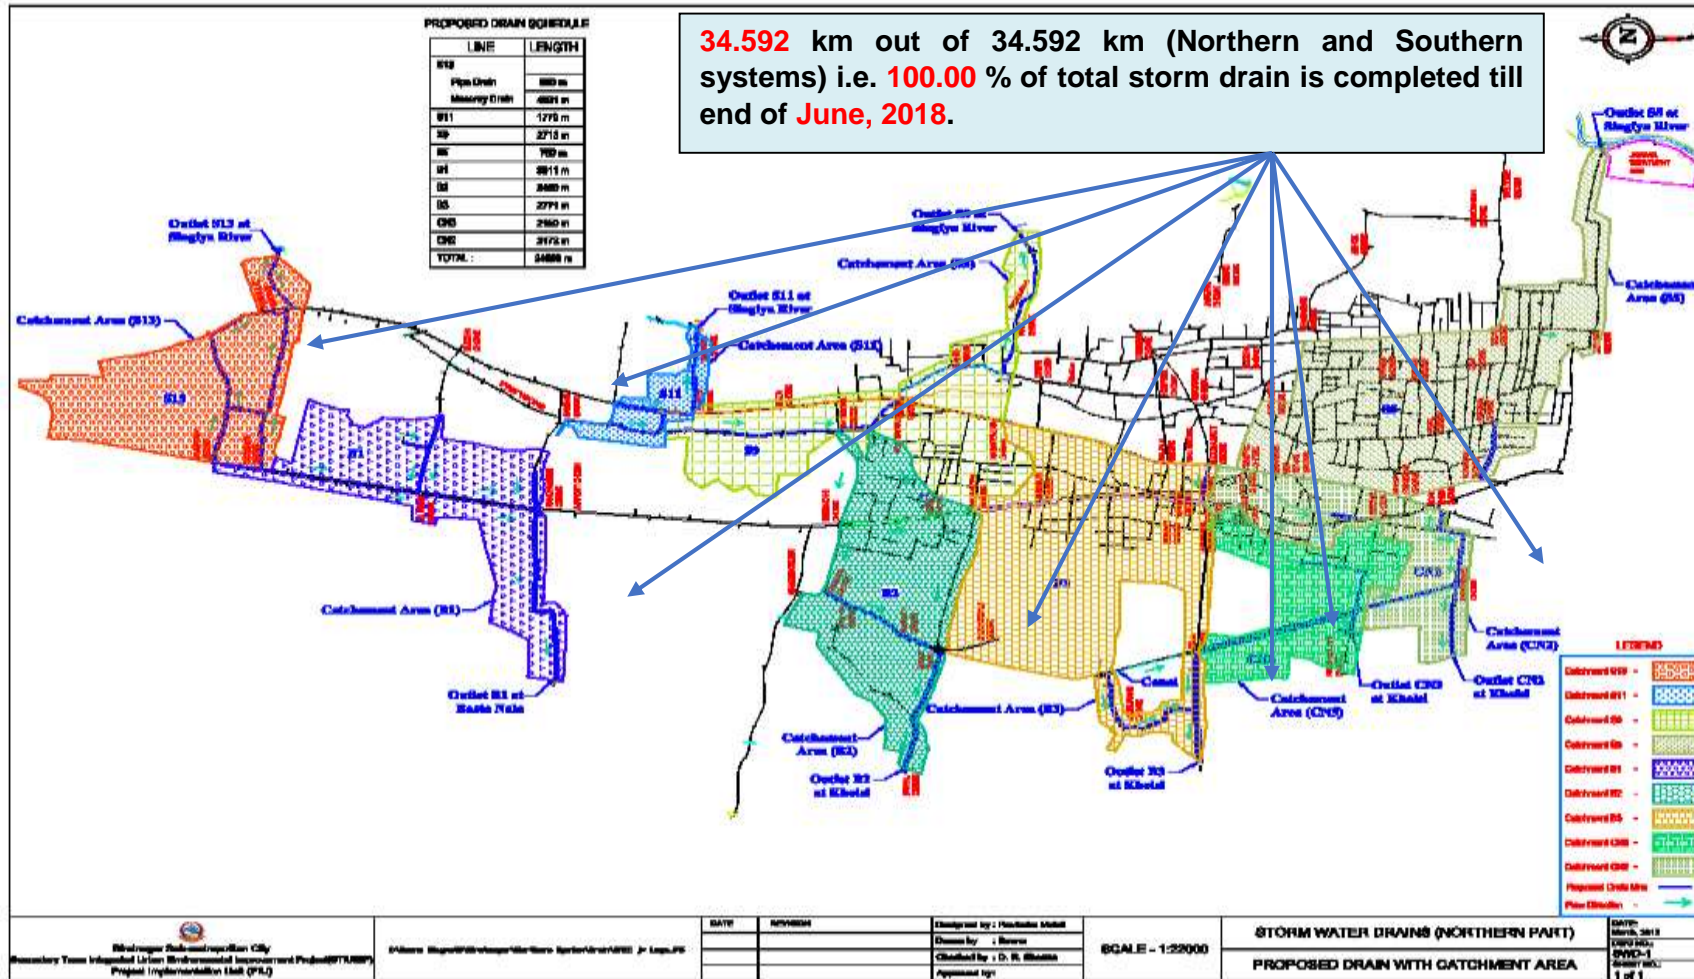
PROPOSED STORM WATER DRAINS IN BMC (Northern Drainage System)
